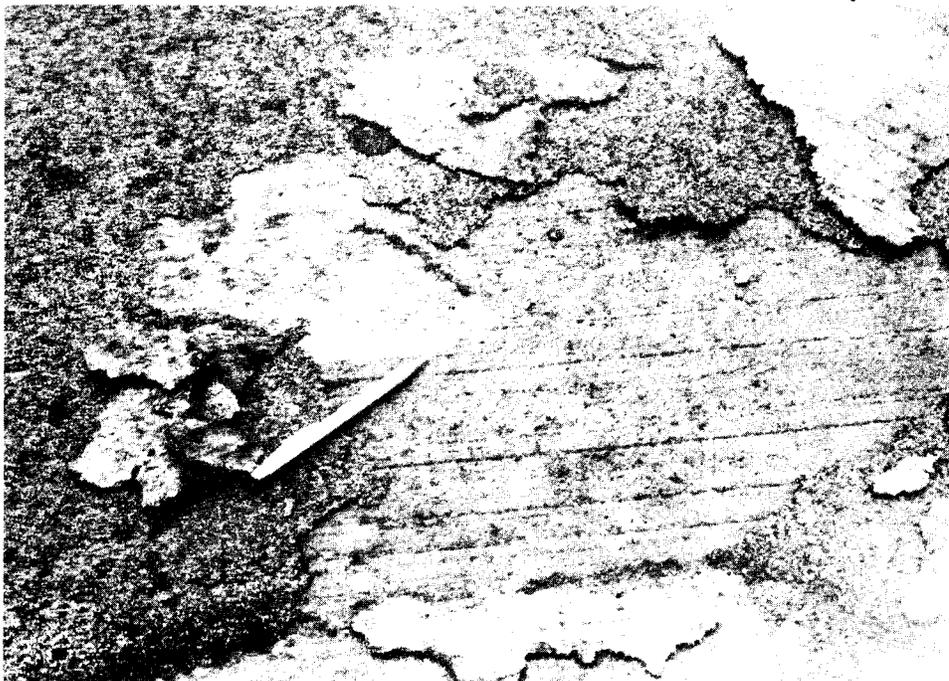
Area of delamination in the Shell MRAX strip with aluminum oxide grit on the Ramp C bridge.
